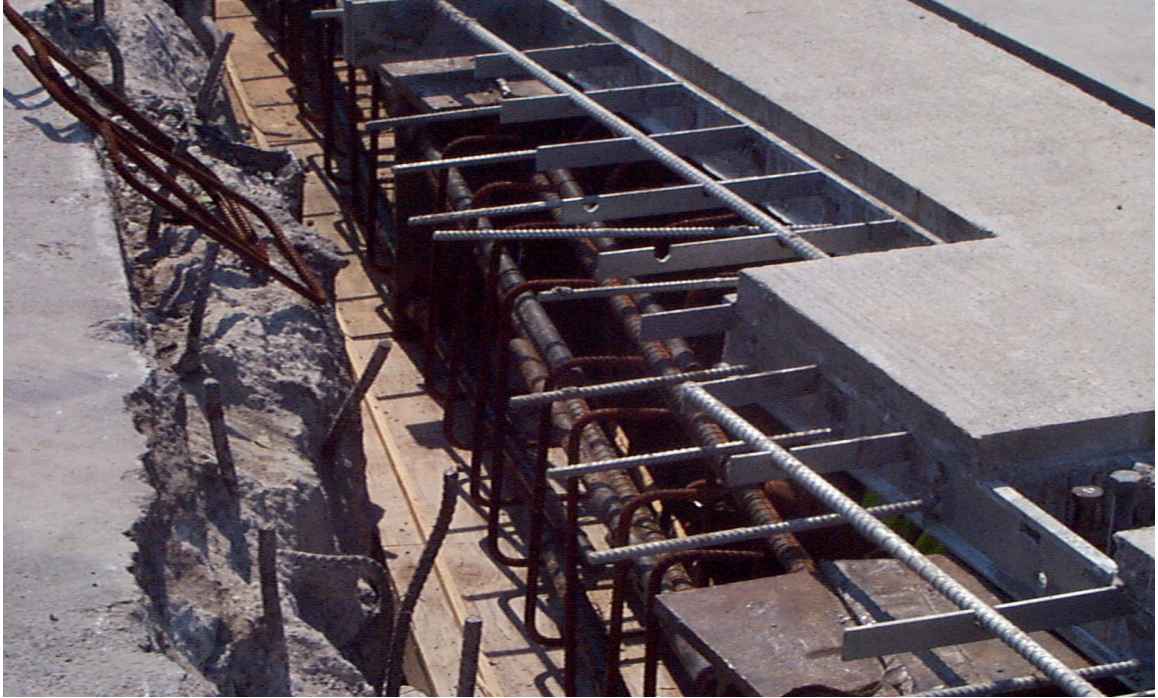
Close-Up of Reinforcing Bars in the End –Span Edge Beam
